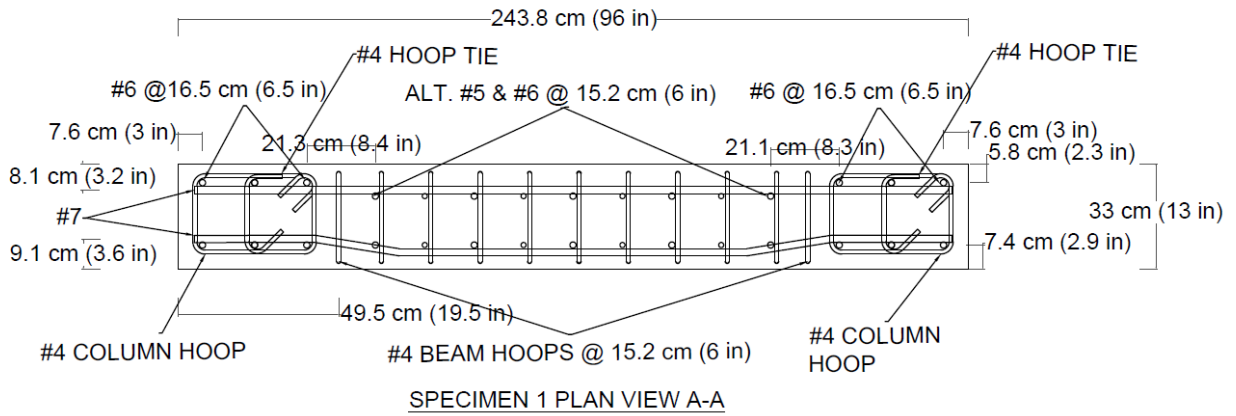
Specimen 1- Reinforcing Steel Layout Plan View A-A
